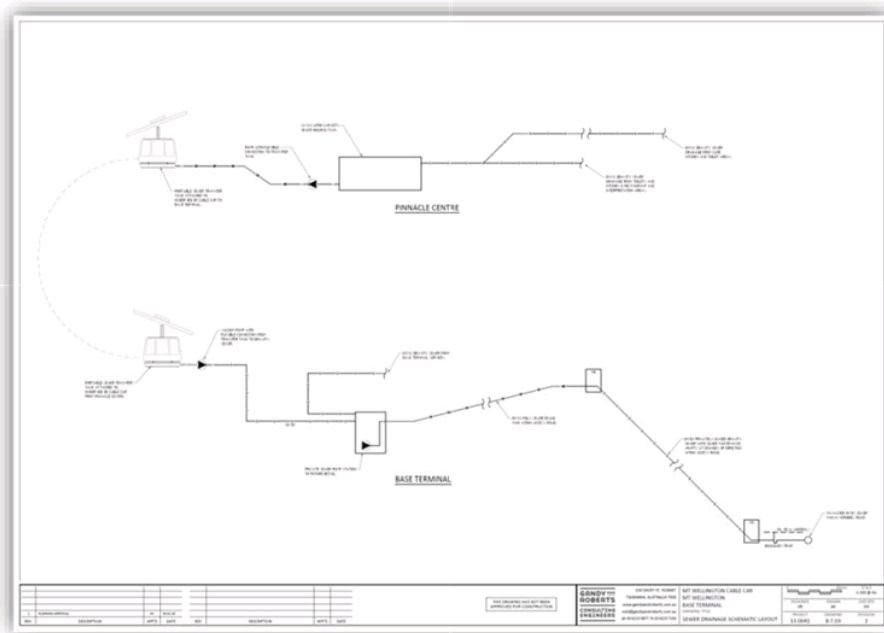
Sewer drainage schematic layout (provided by MWCC).
